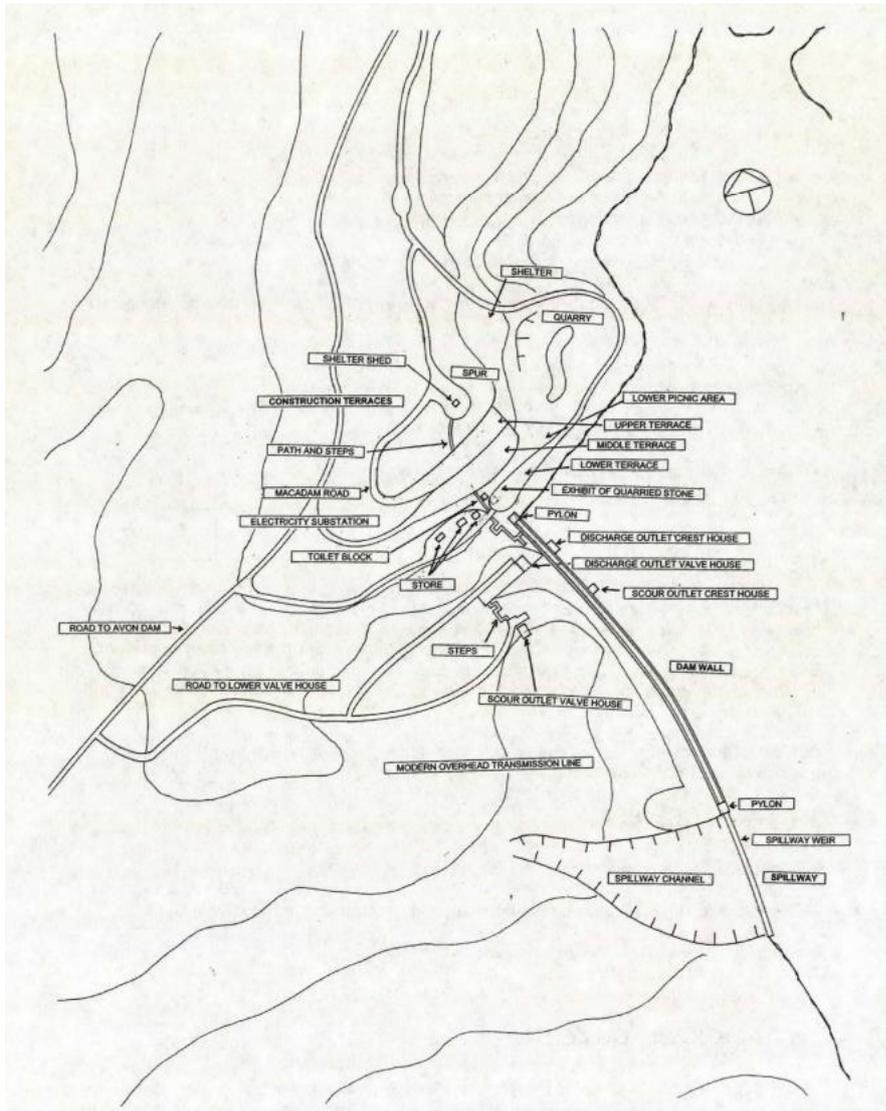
Cordeaux Dam site plan (Source: Sydney Catchment Authority Metropolitan Dams Conservation Management Plan 2003)
